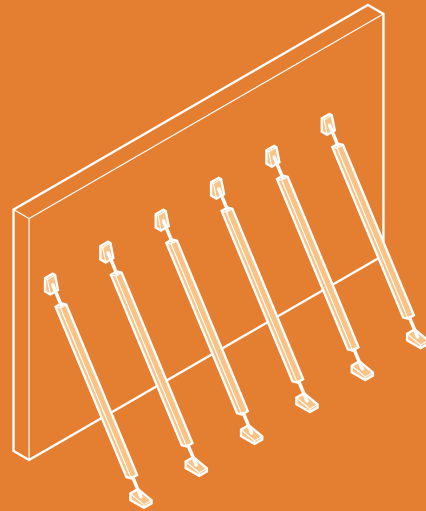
Temporary bracing of prefabricated concrete wall panels.
